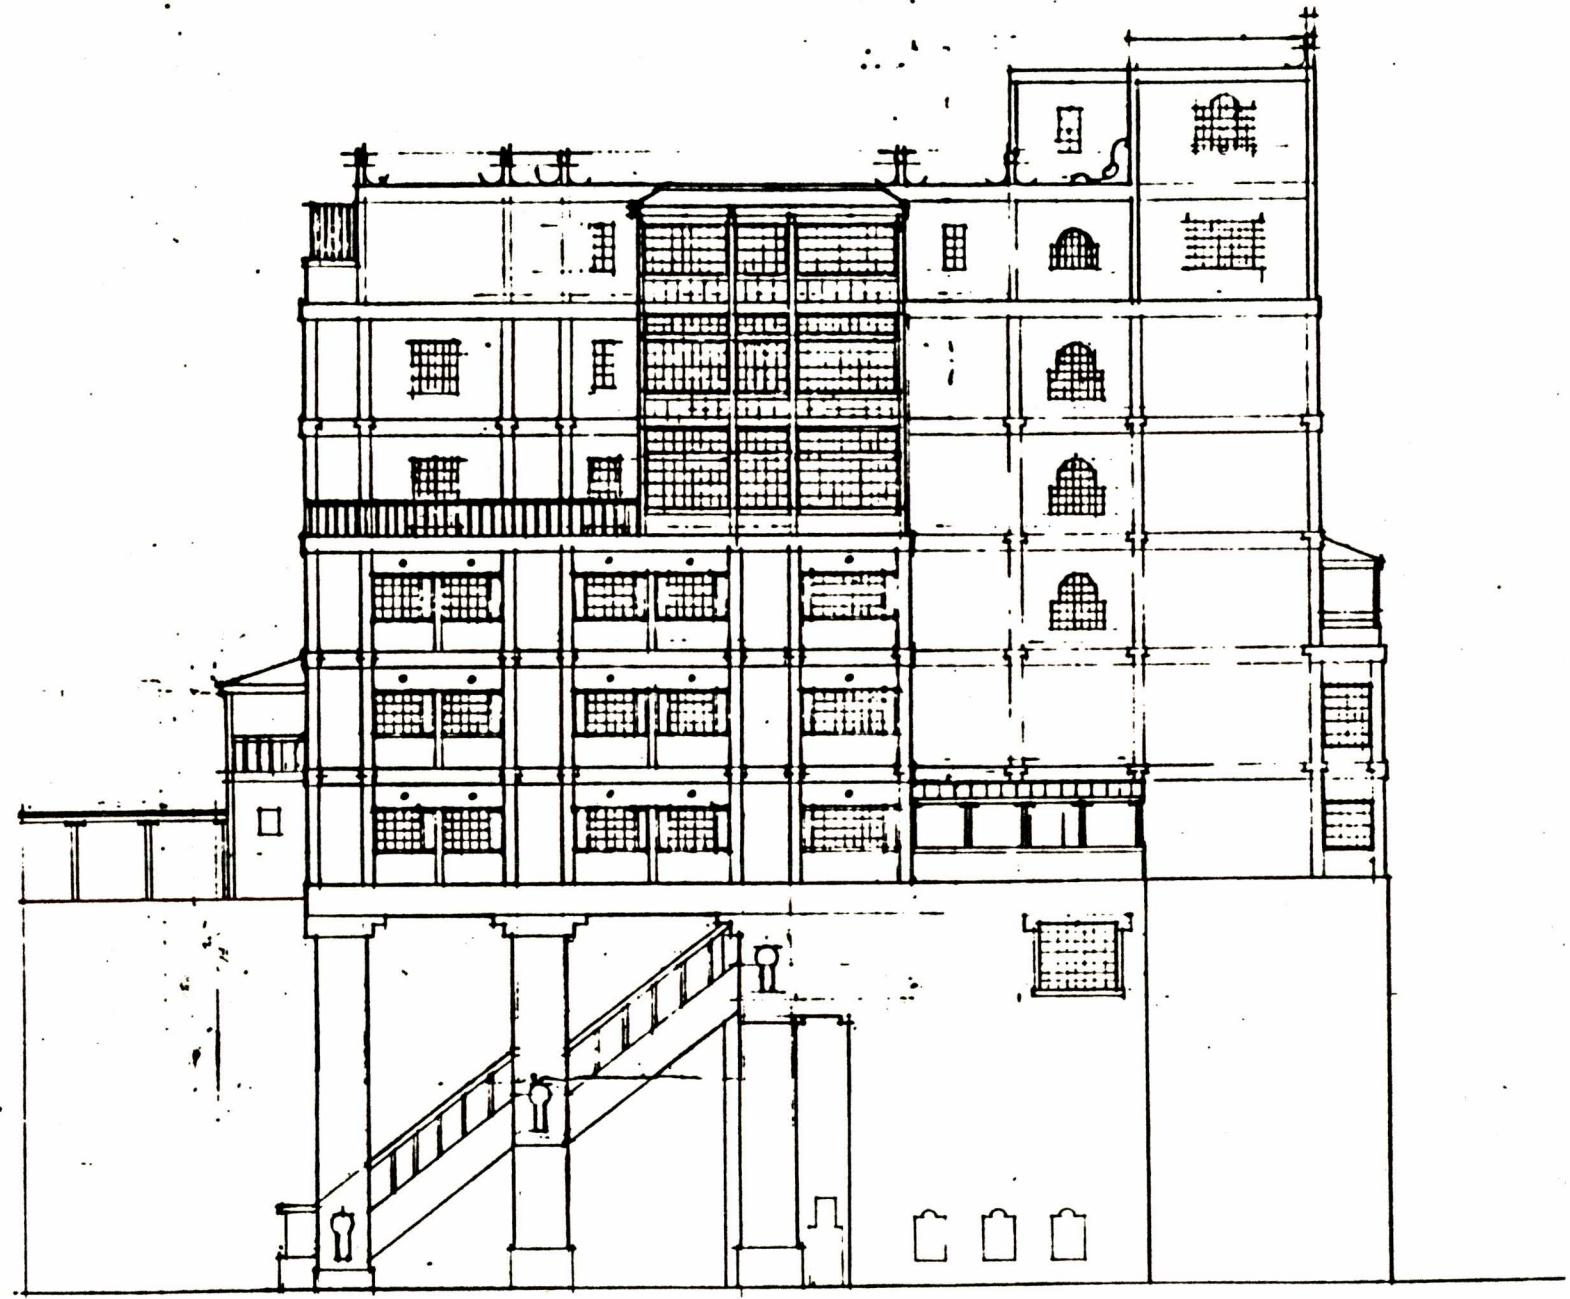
SOUTH ELEVATION OF PROPOSED BUILDING
